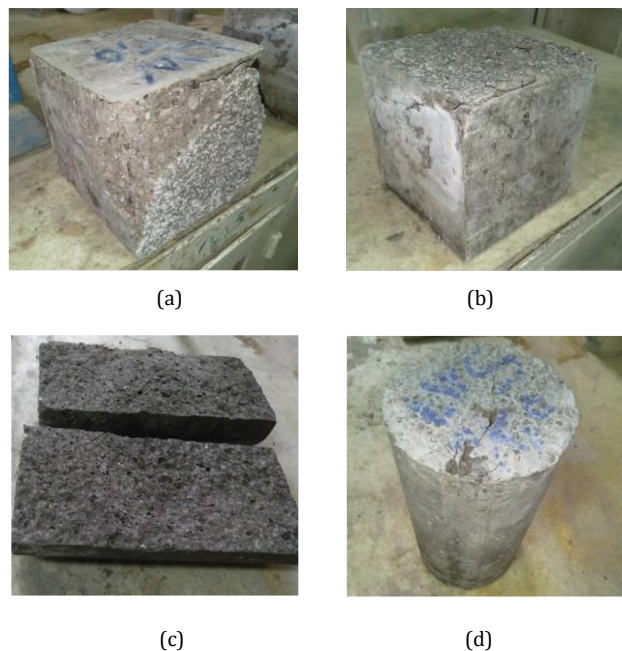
Mechanical test specimens: a) light weight concrete in compressive test, b) steel fiber reinforced light weight concrete in compressive test, c) light weight concrete in tensile test, d) steel fiber reinforced light weight concrete in tensile test
